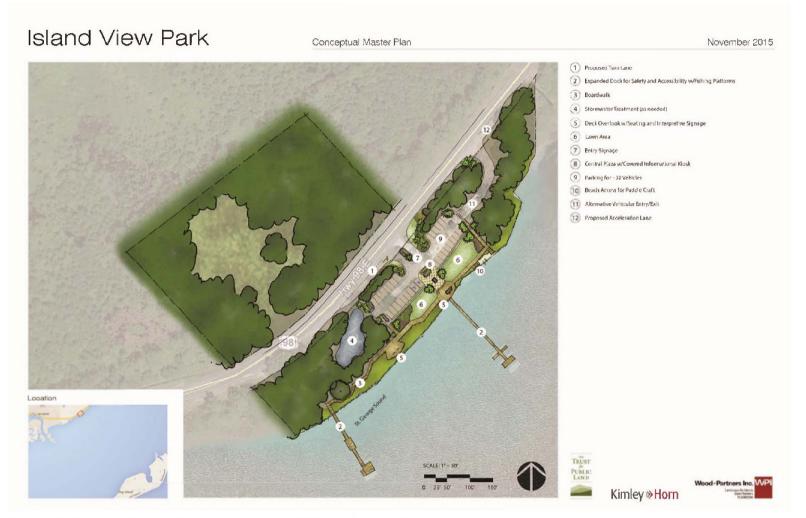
Proposed Island View Park Conceptual Plan. Bottom right of the conceptual plan shows the existing docks.
